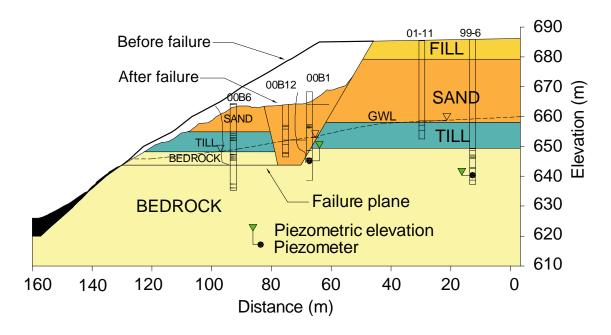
Pre and post-failure cross section of Whitemud Road Landslide
